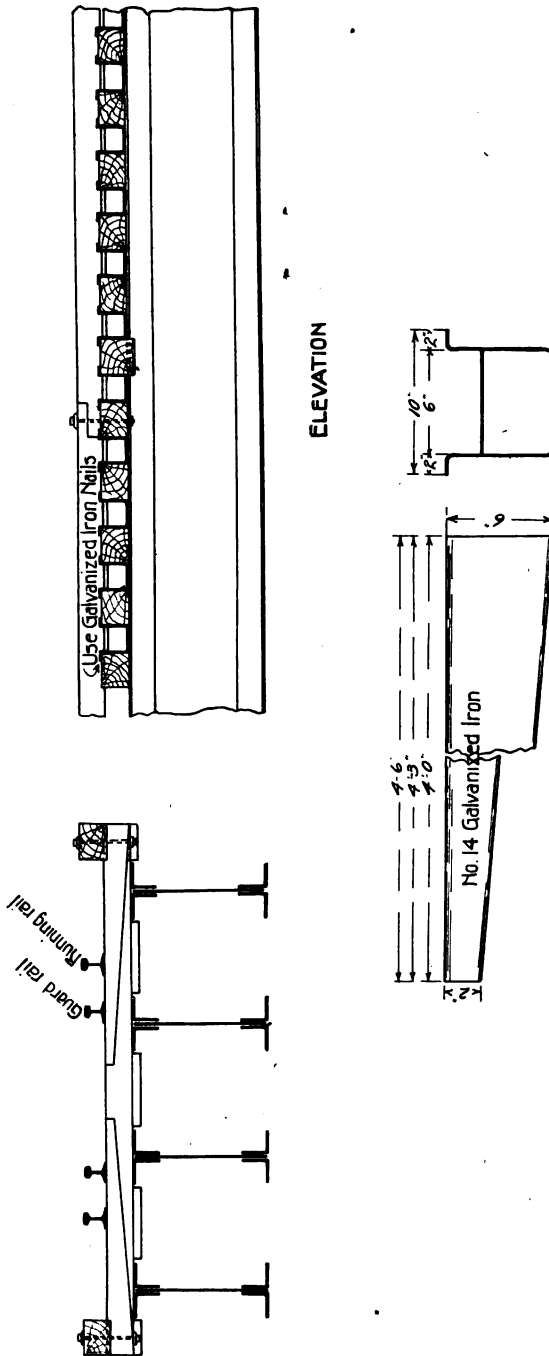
I. C. R. B. Proposed Method of Protecting Floors of Iron Bridges from Brine and Water.
